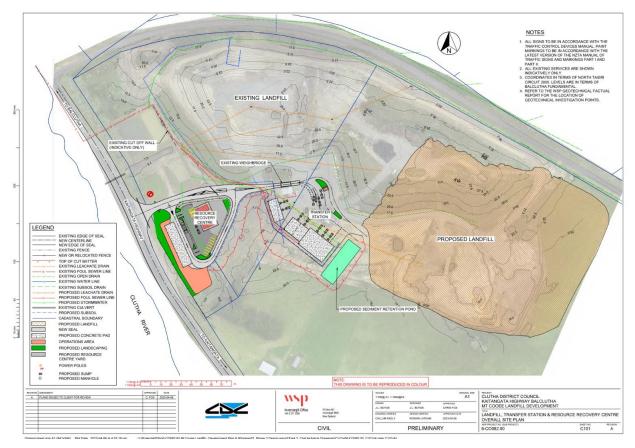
Site plan showing the proposed expansion of the Mt Cooee Landfill (WSP 2023a).
